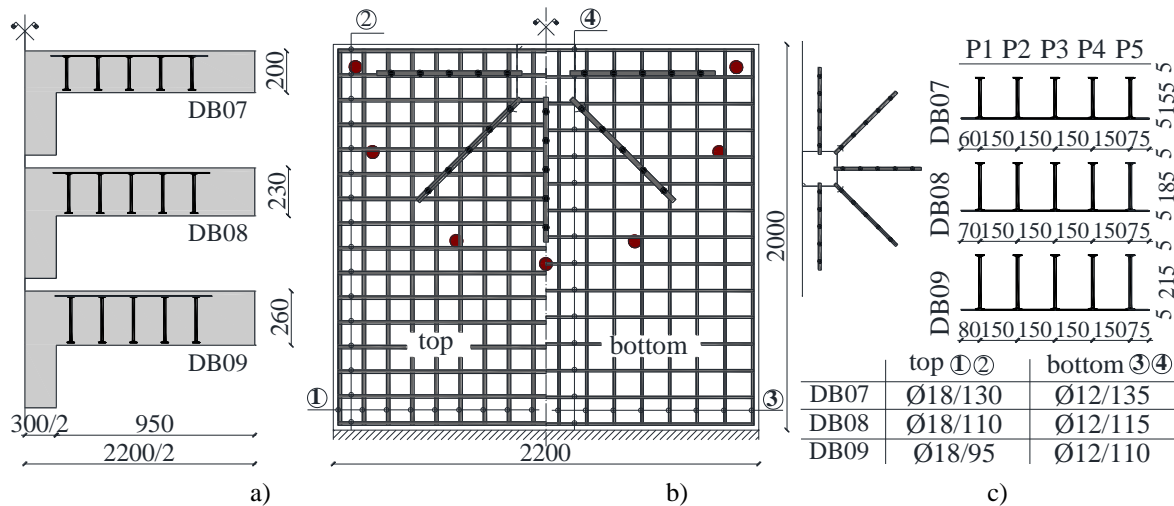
a) Tested specimens, b) Reinforcement layout and dimensions
